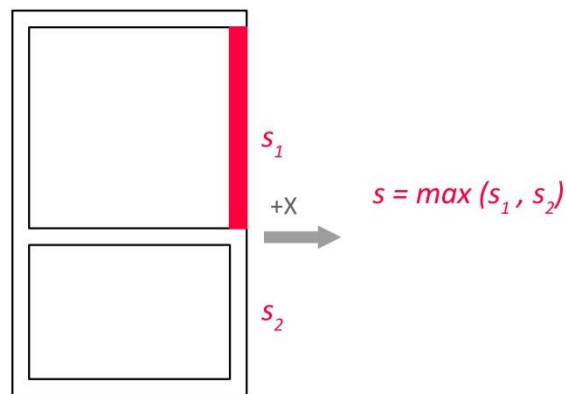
For a specific direction, always the maximum wall span should be adopted (plan view)
